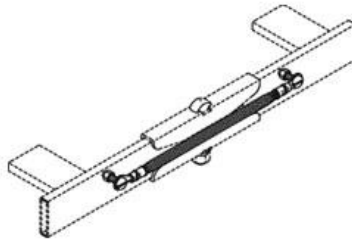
Ladder style cable tray showing how ladder sections should be bonded across junctions.
